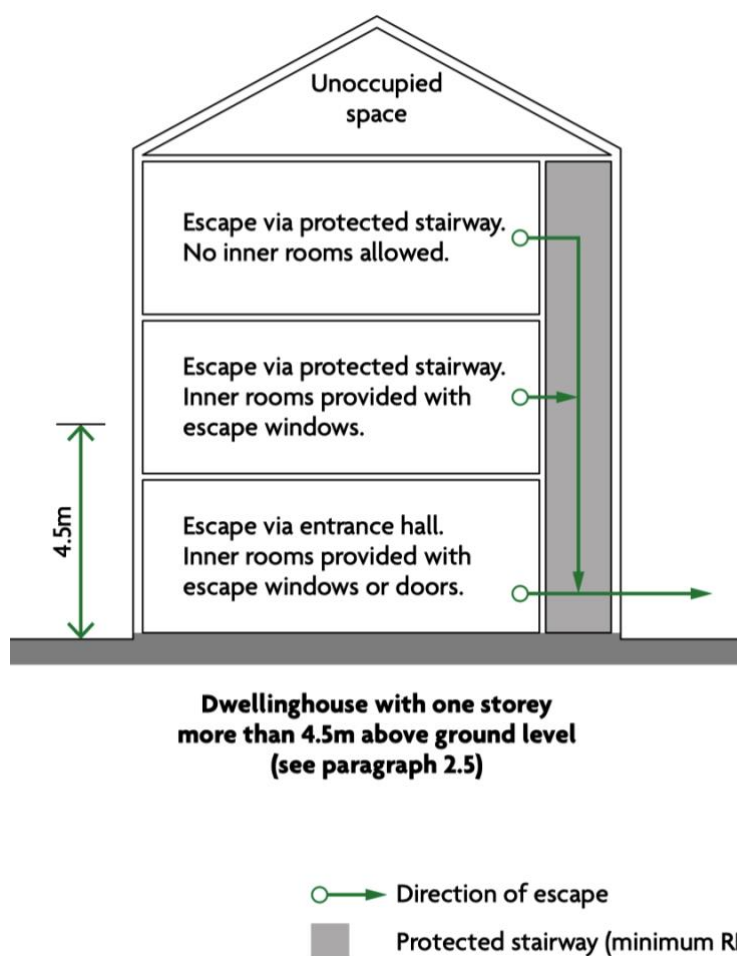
image from ADB1 illustrating a typical dwelling with one storey more than 4.5m above ground
